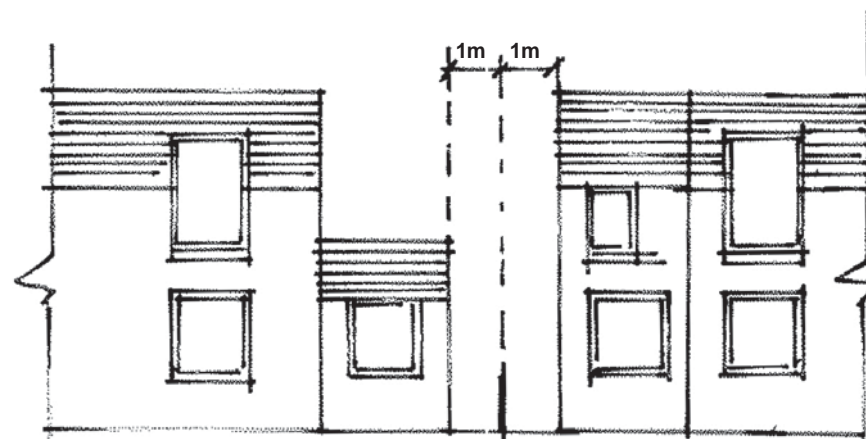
A minimum of 1 metre must normally be retained between the new side wall of the extension and the boundary of the site to prevent a terracing effect
